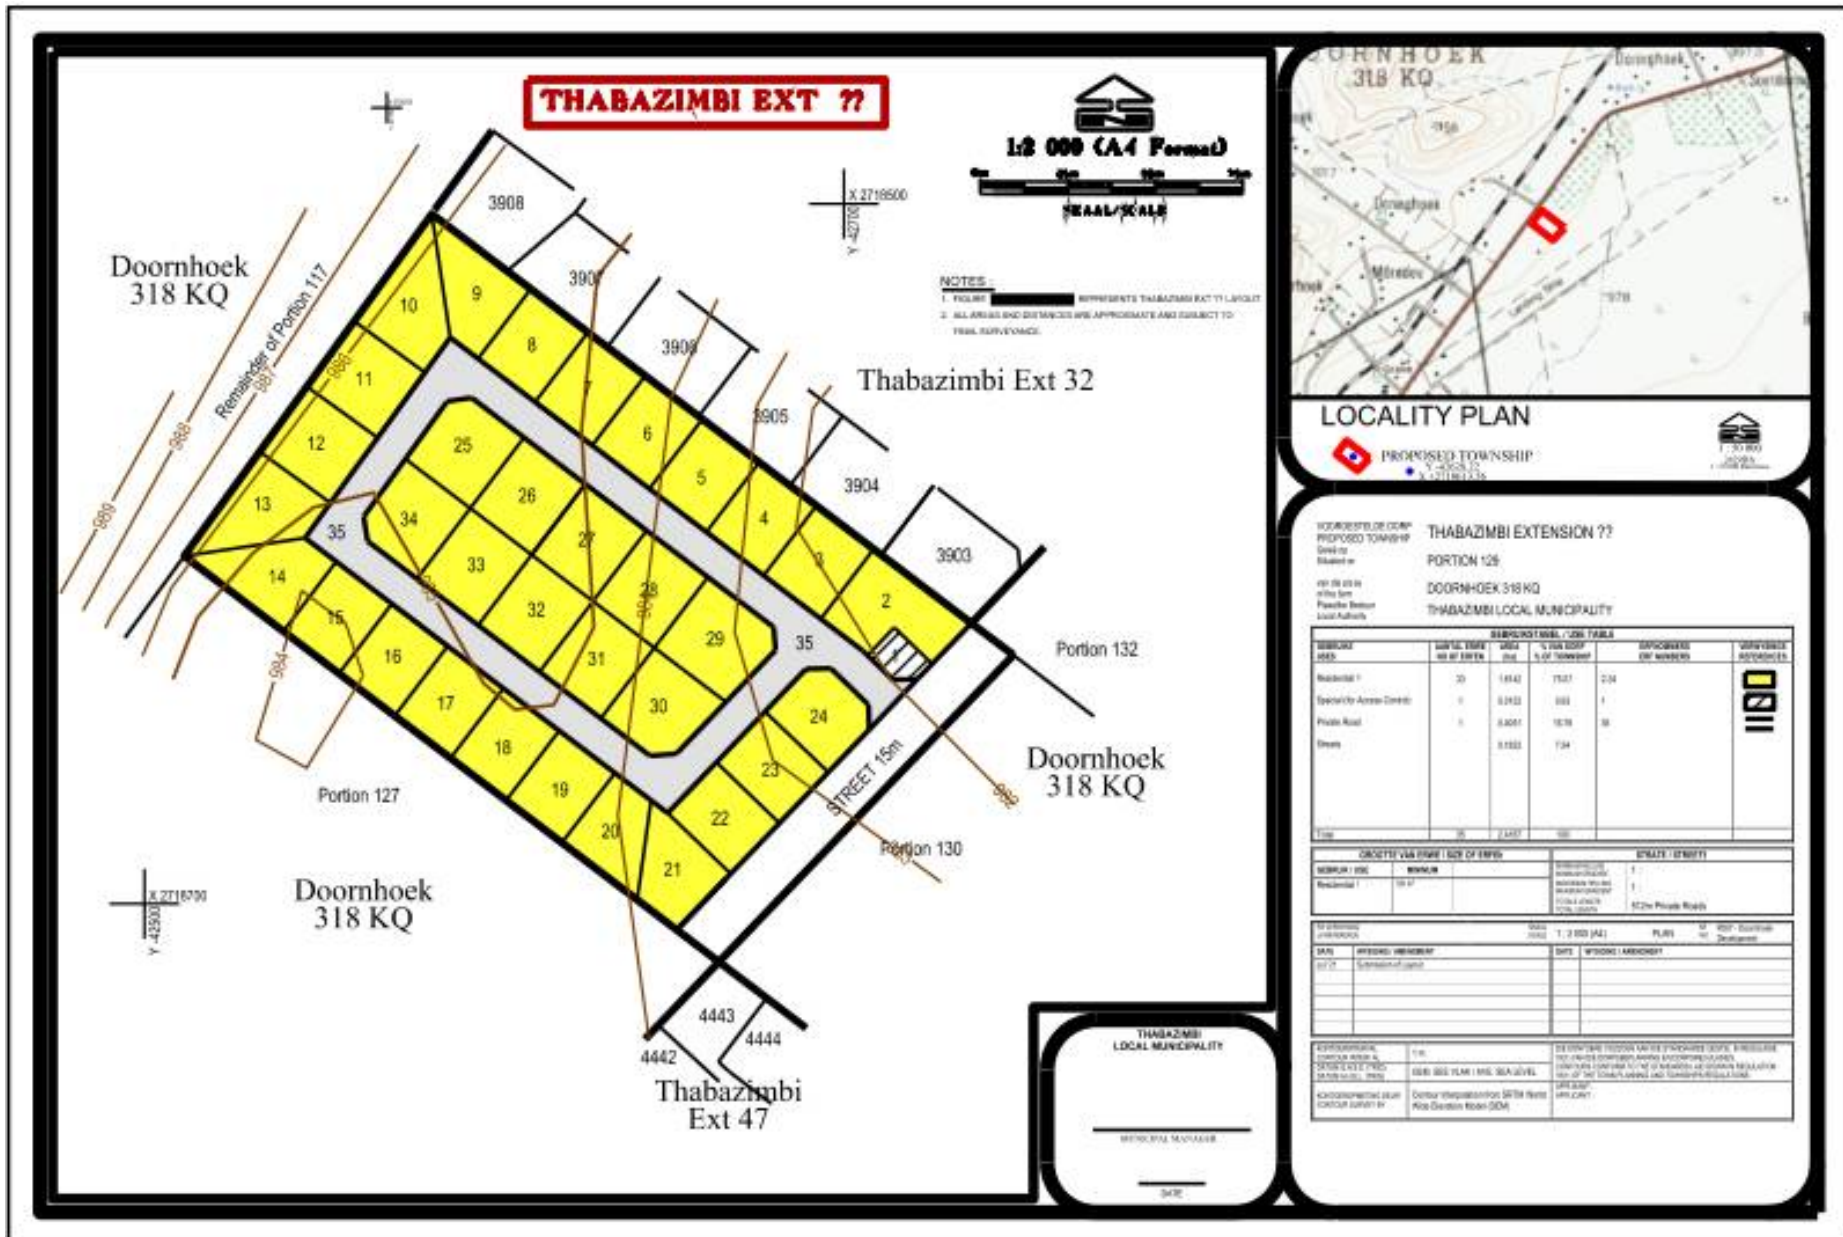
Proposed Thabazimbi Extension 75 layout plan (courtesy of Urban Edge Town Planners)
